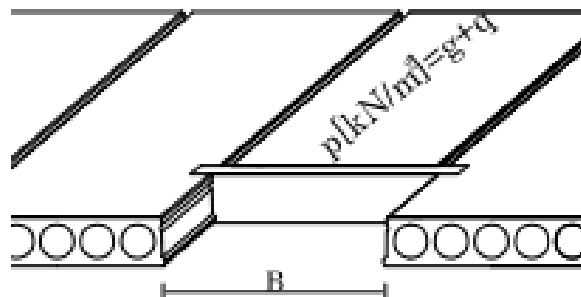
Supporting a cut hollow core slab with a steel beam. Reprinted from Parma (2013) [16,26]
